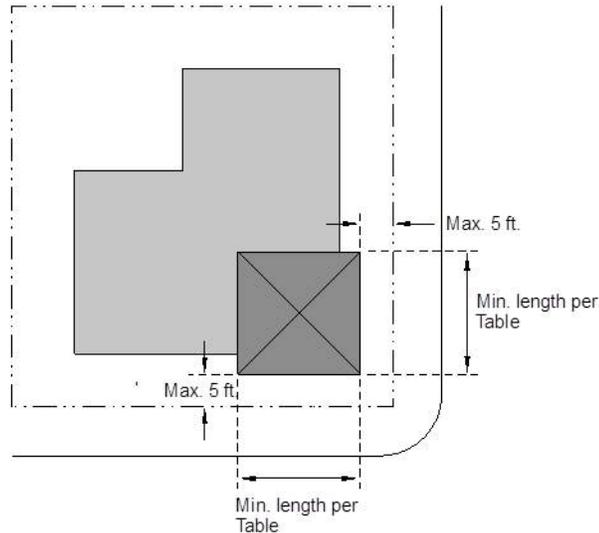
C: CORNER FRONTAGE STANDARDS
